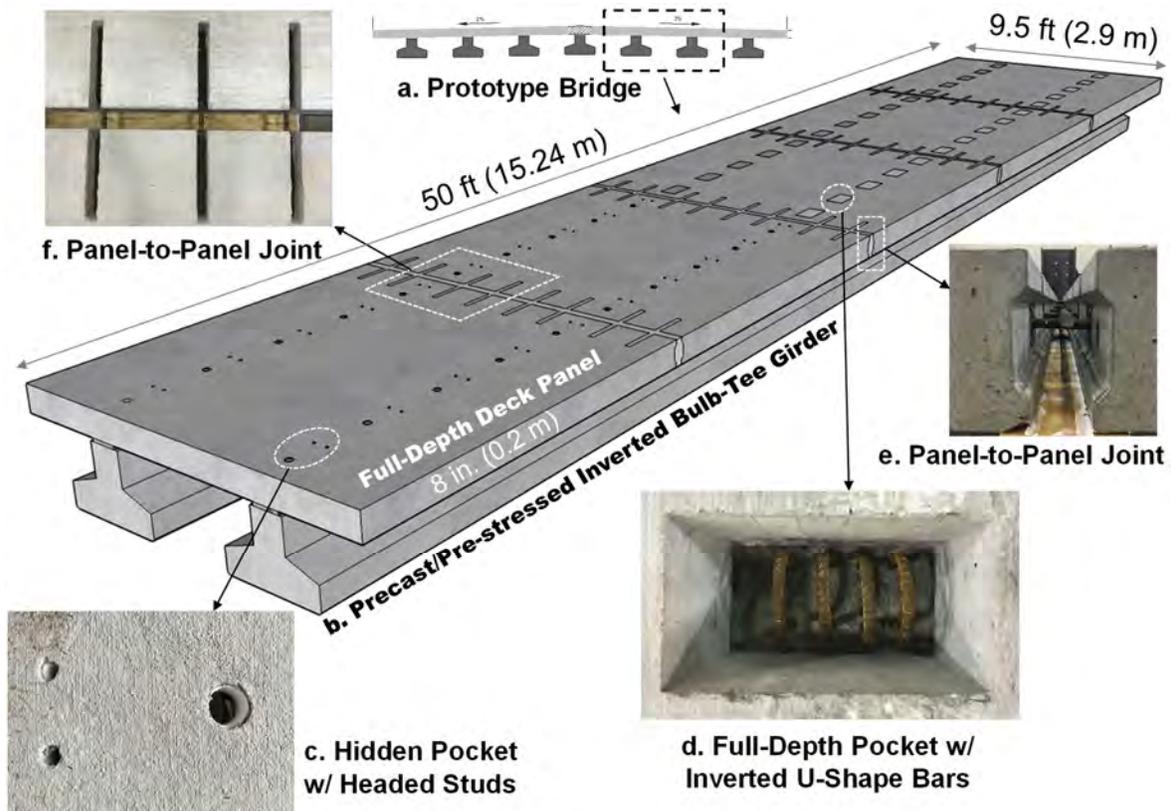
Full-Scale Fully-Precast Bridge Test Specimen (1)
